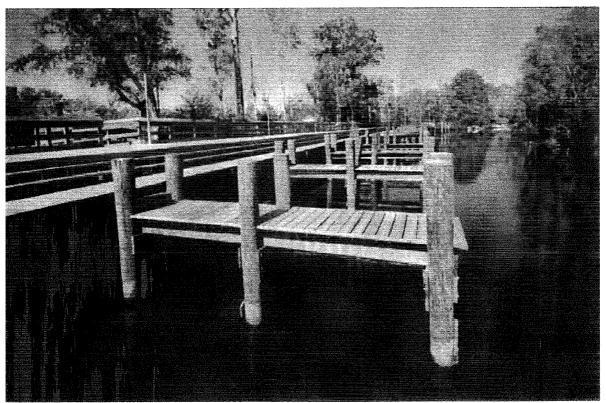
Figure C. A photo of other structures present at the Lafayette Creek boat ramp facility.
